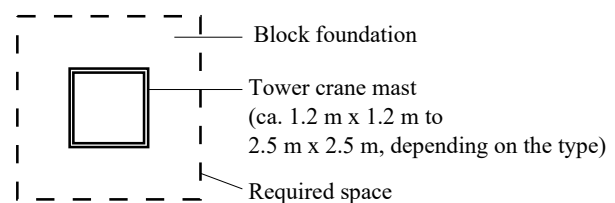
Top view of a tower crane mast with dimensions (Schach and Otto, 2017, p. 28).
